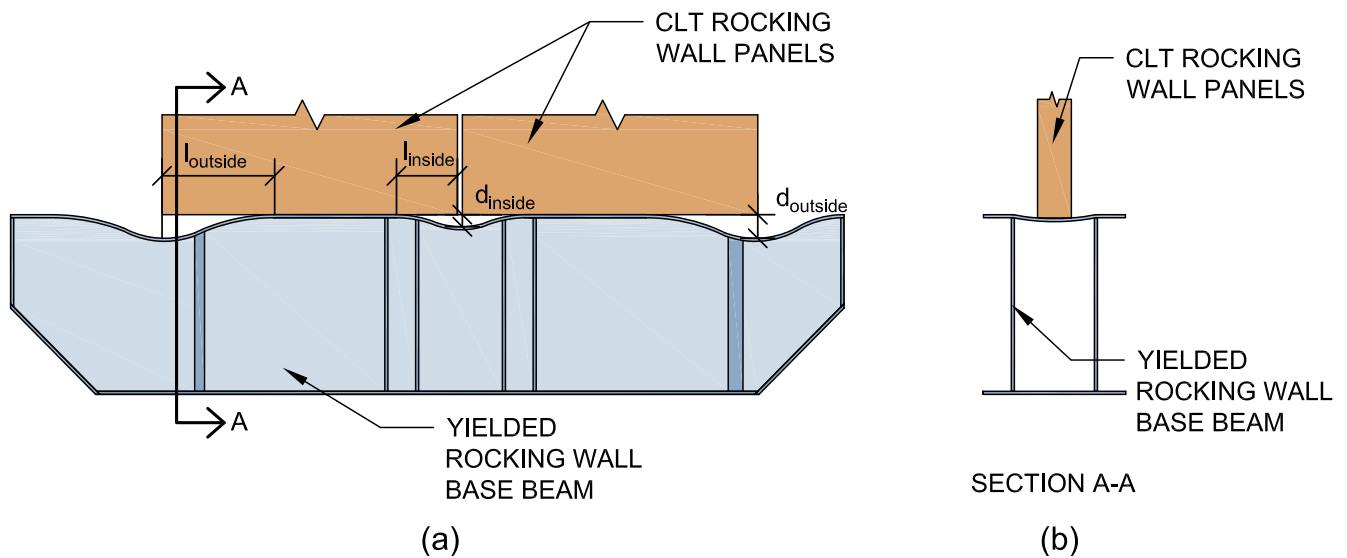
Yielded base beam shape at end of testing (a) plan view (b) cross section view
